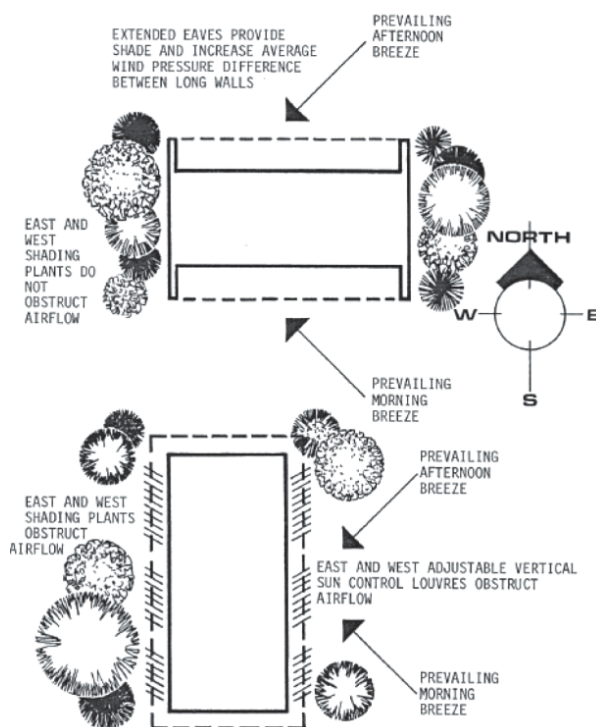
Orientation of long walls to minimize obstruction of openings by shading devices
